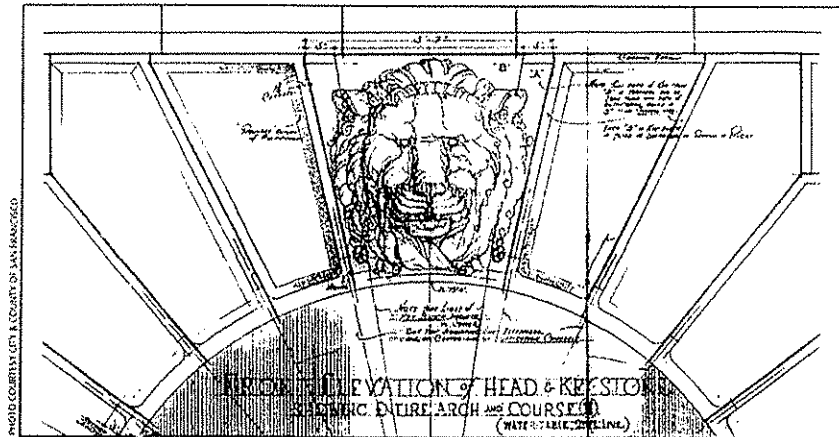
Original 1932 detail for exterior Lion's Head keystone by Bakewell & Brown Architects.
